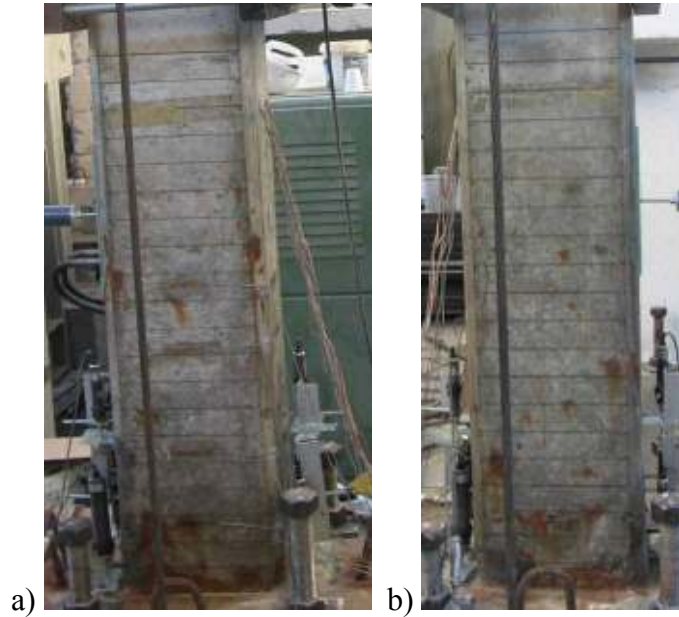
Pattern of cracks formed due to corrosion: (a) North, (b) South.
